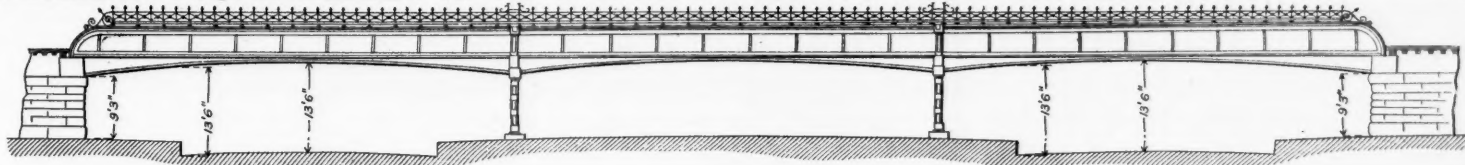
Elevation of the Bridge at Garfield Boulevard—Track Elevation in Chicago.
